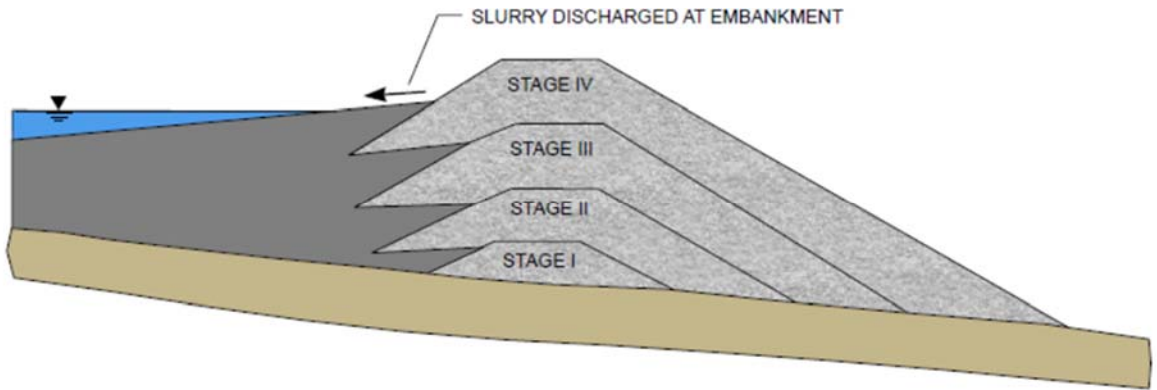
Centerline staging method (Engineering and Design Manual. Coal Refuse Disposal Facilities, 2009)
